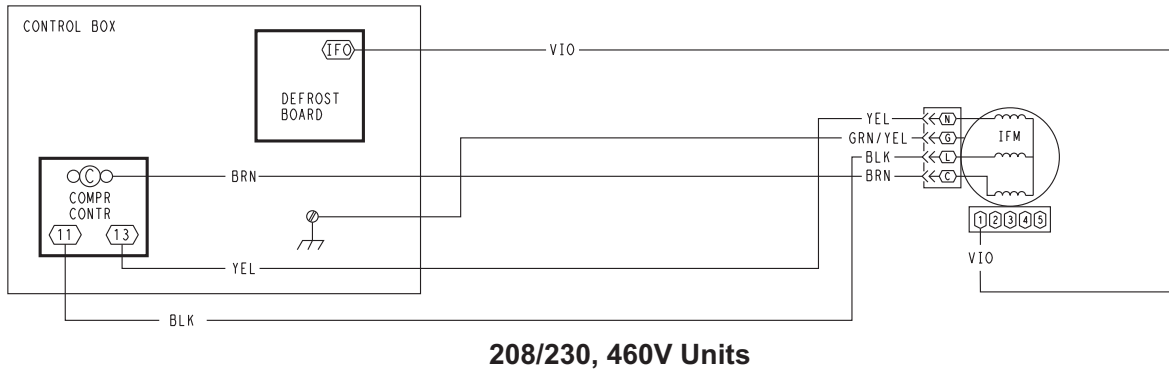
50HCQ Direct-Drive Supply Fan Assembly
